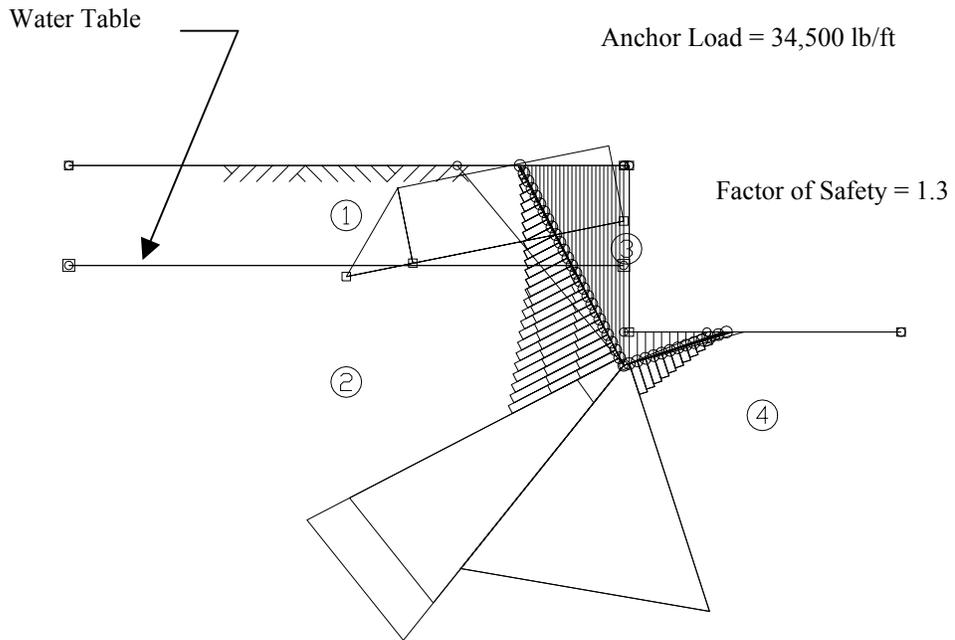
30-ft-high wall, failure plane analysis check—partially submerged condition on the retained soil side (only)
